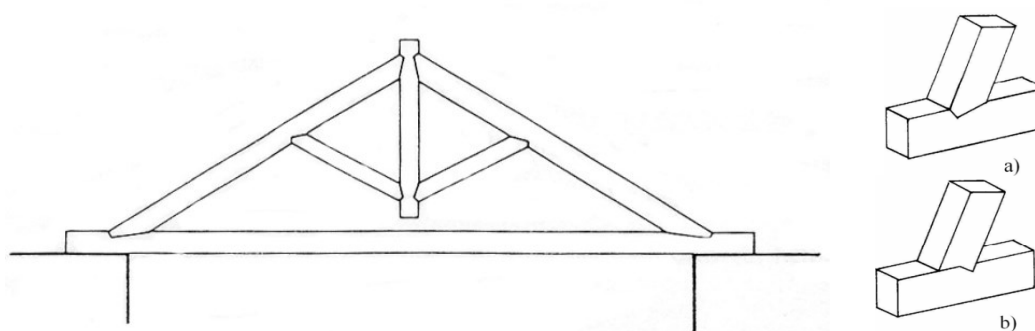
Typical roof truss (left), (a) birdsmouth joint; (b) its reversed form.
